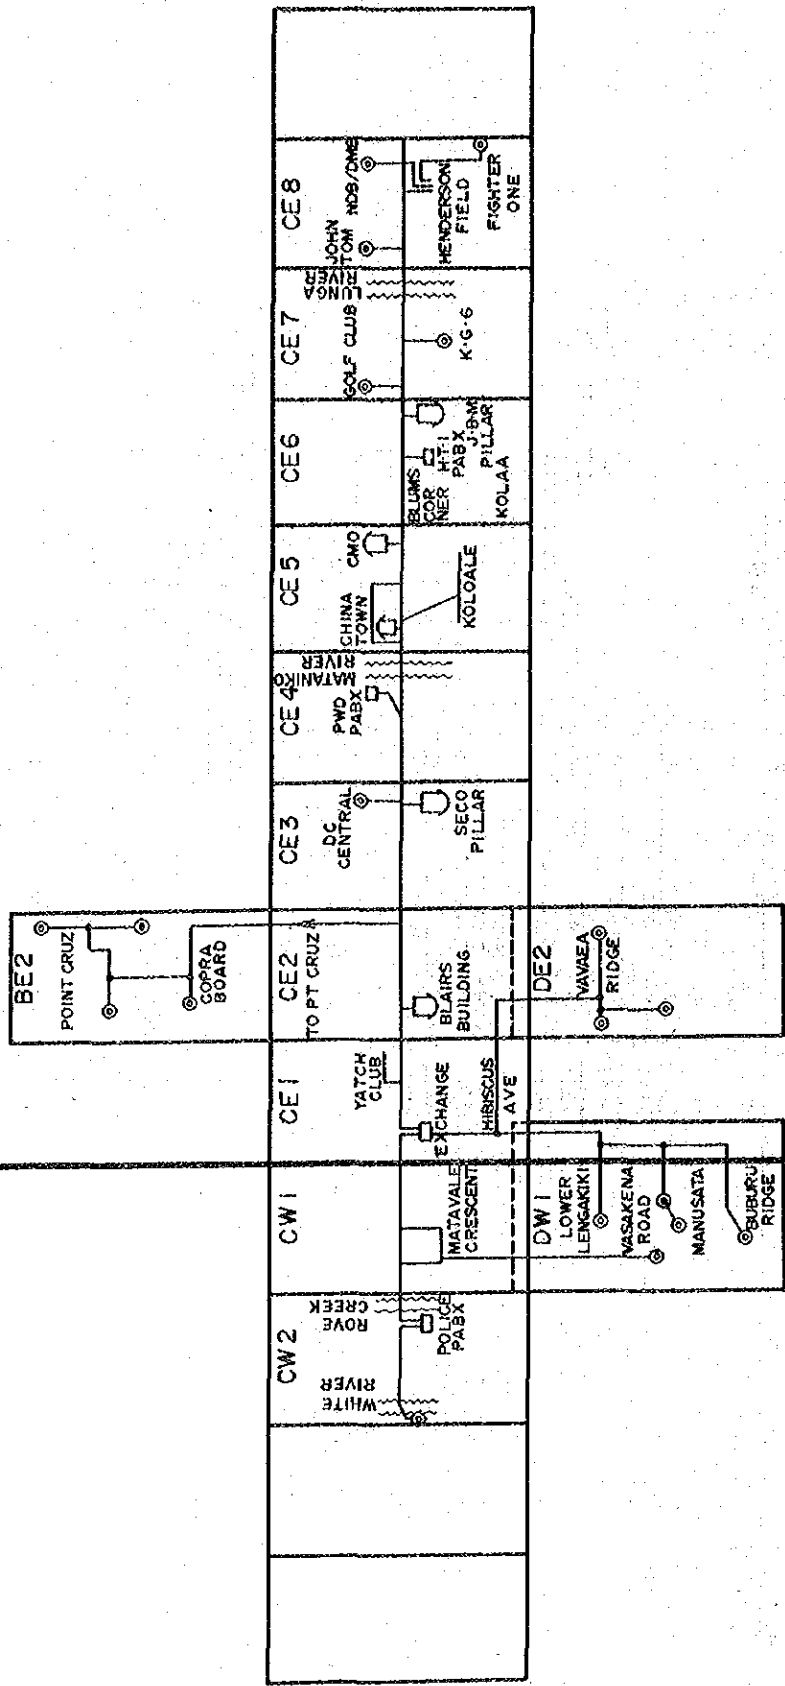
STRAIGHT-LINE CABLE PLAN,
